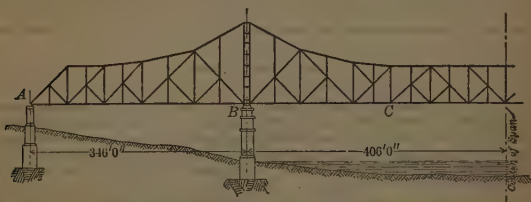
Wabash R.R. Bridge, Pittsburgh, Pa.
